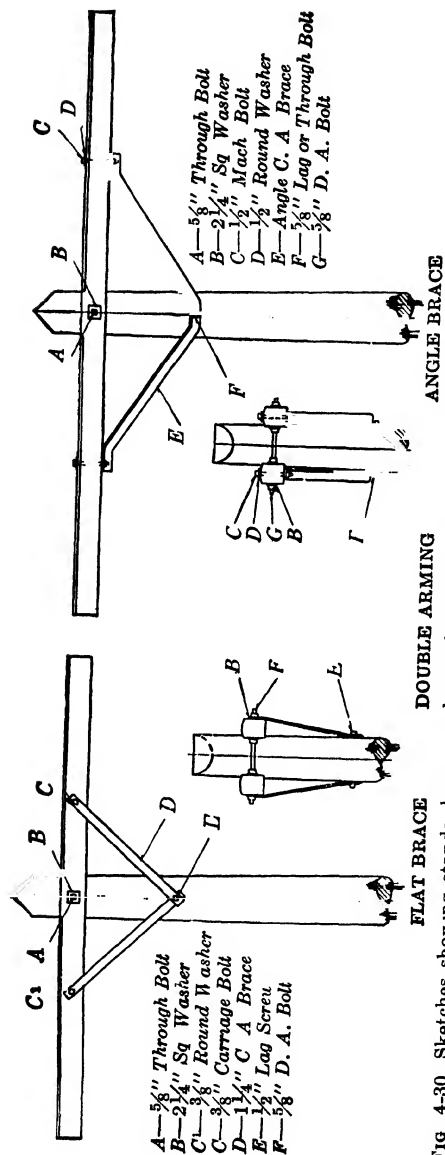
Sketches showing standard sizes and use of bolts lags and washer in single- and double-crossarm assembly.
